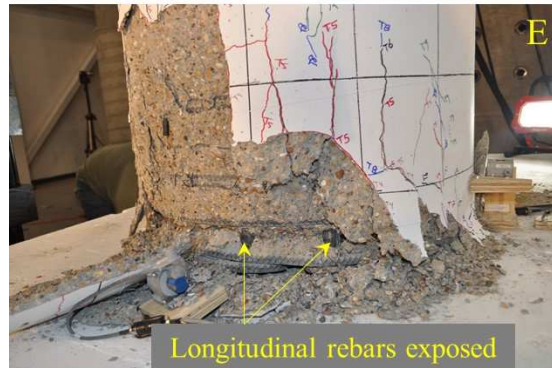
Damage in RC rocking column at 12.93% drift ratio: exposure of longitudinal rebar.
